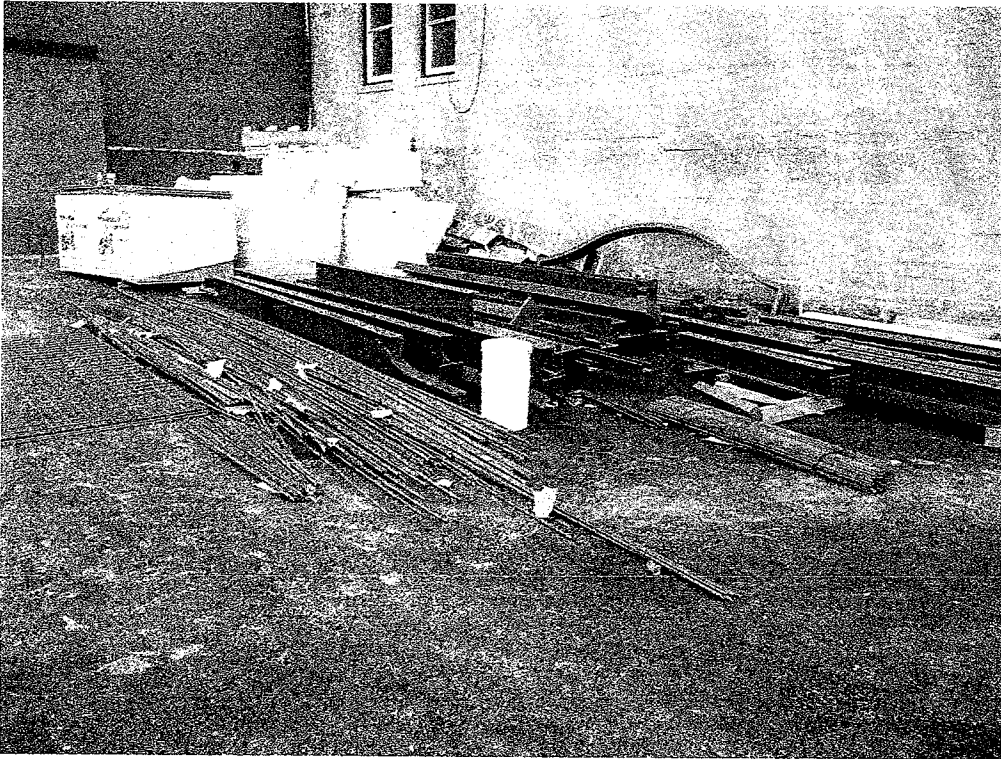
Structural steel for Rear Entry delivered to the project site.
